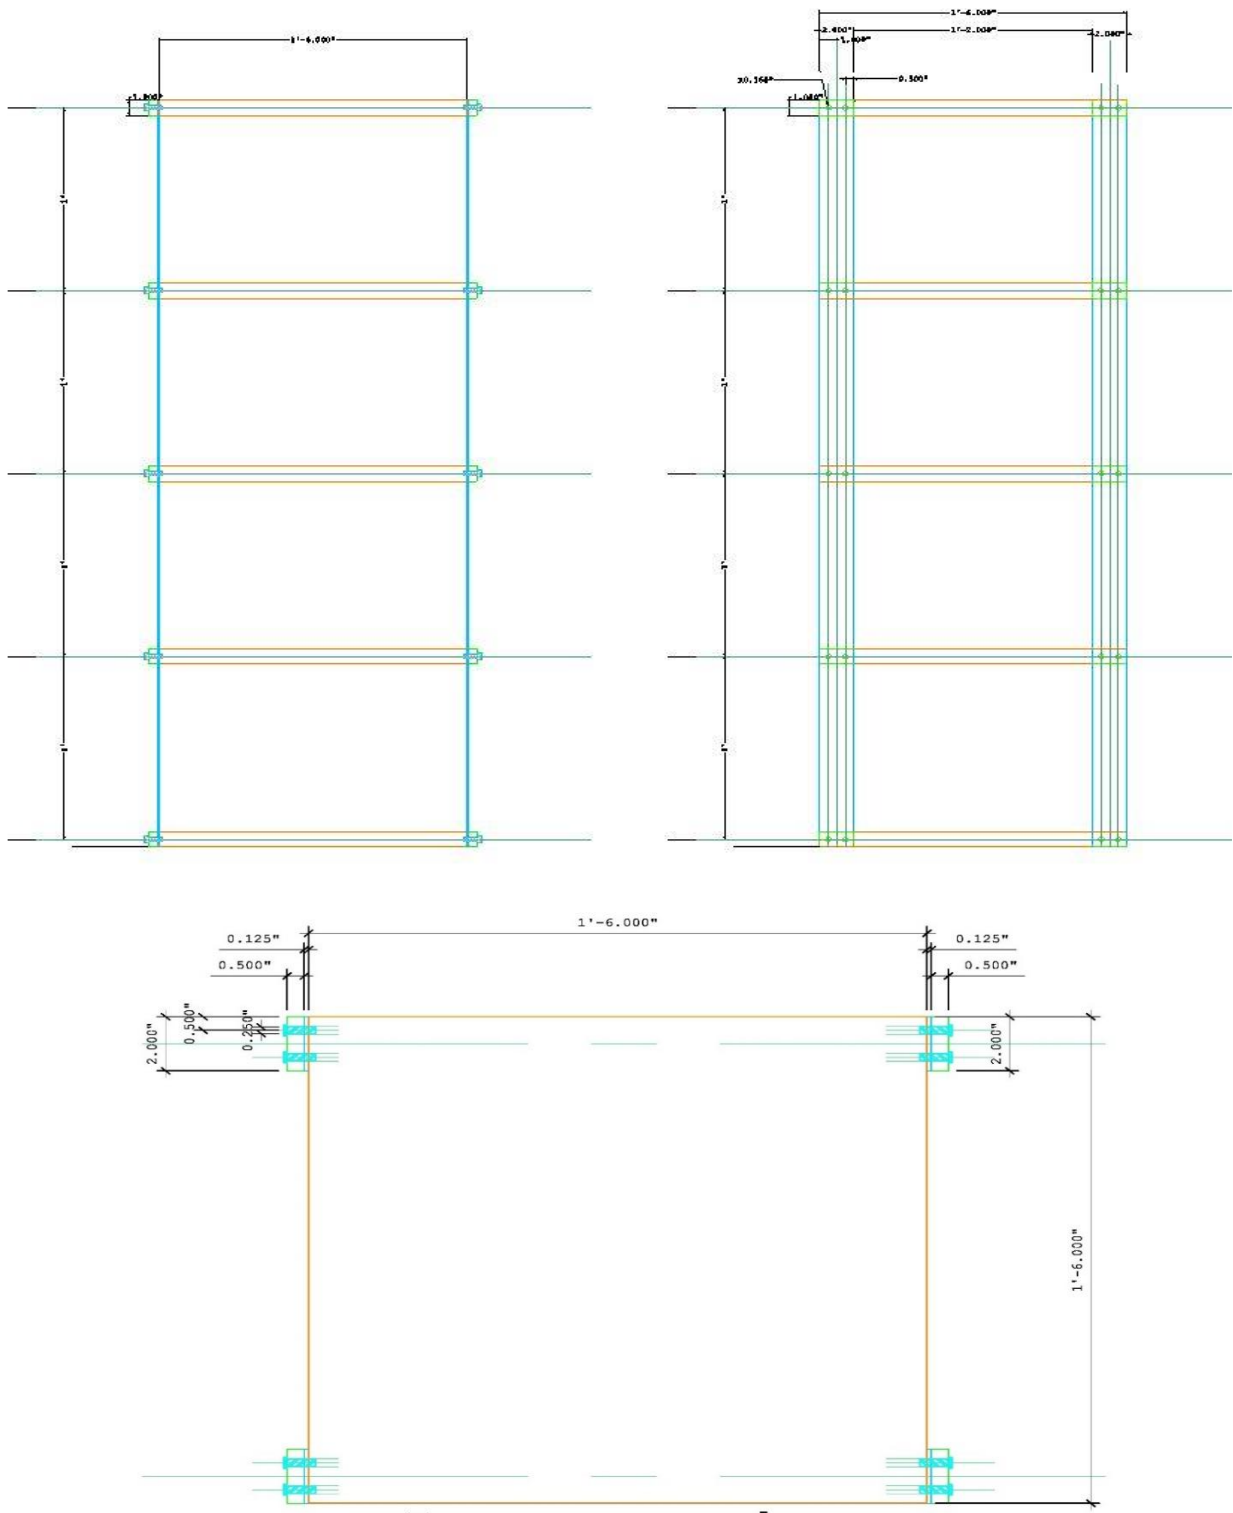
Elevation (top) and plan (bottom) and views of the four-story scaled structure
